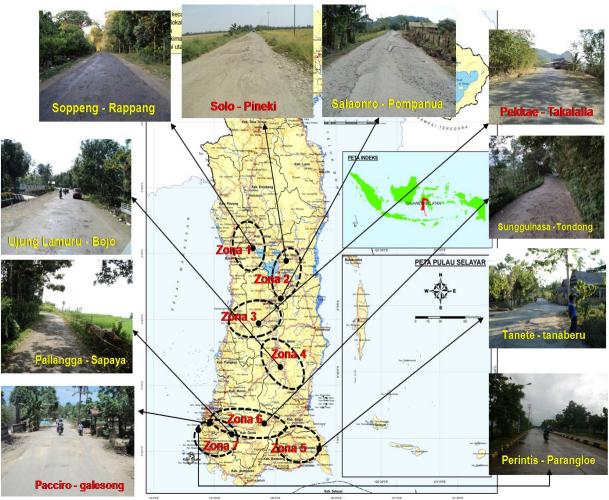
Distribution of Locations of the Proposed Road Sections (CV Kiyoka Engineering Consultant 2012)
